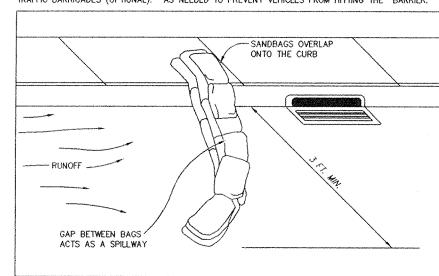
B. DETAIL OF A SANDBAG CURB SEDIMENT BARRIER TO PROTECT A CURB INLET.
